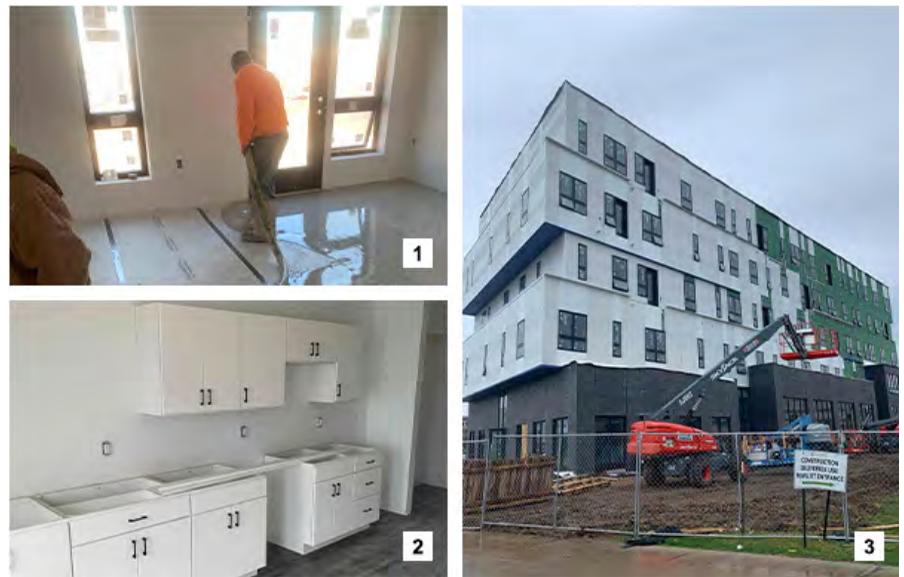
Crews pouring gypcrete to level floors. (2) Fourth floor cabinetry and pulls installed. (3) East elevation with siding and sitework ongoing.
